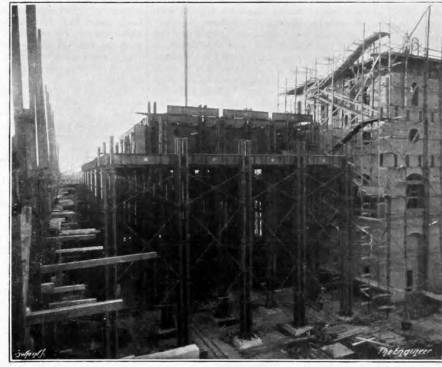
DEVOTO RESERVOIR—ERECTION OF COLUMNS UP TO FIRST FLOOR
